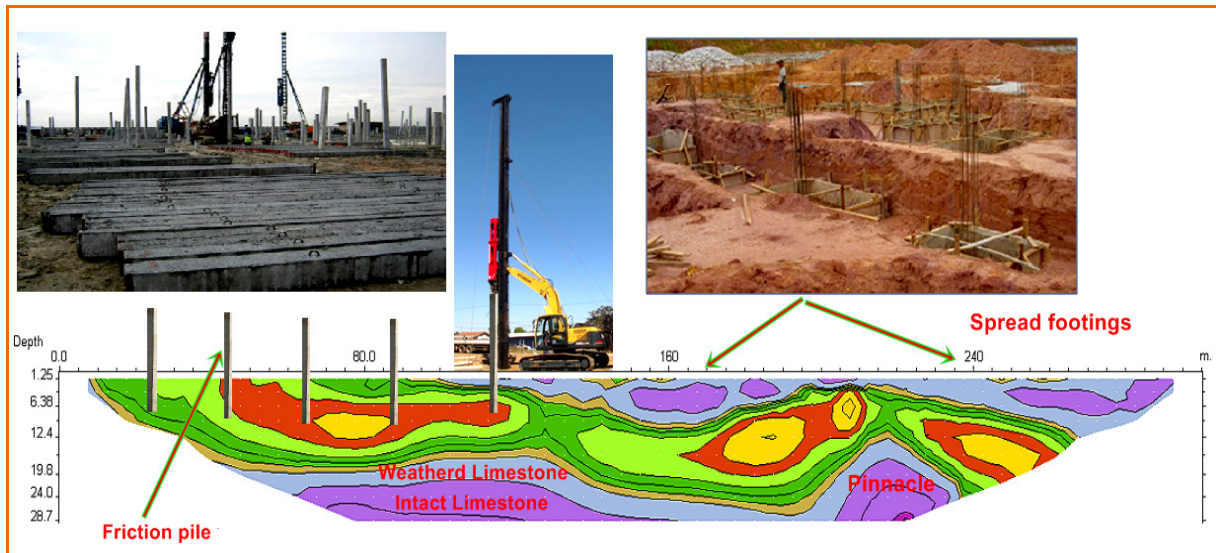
Presenting the Skin Friction Piles and spread footings under construction in construction site #2
